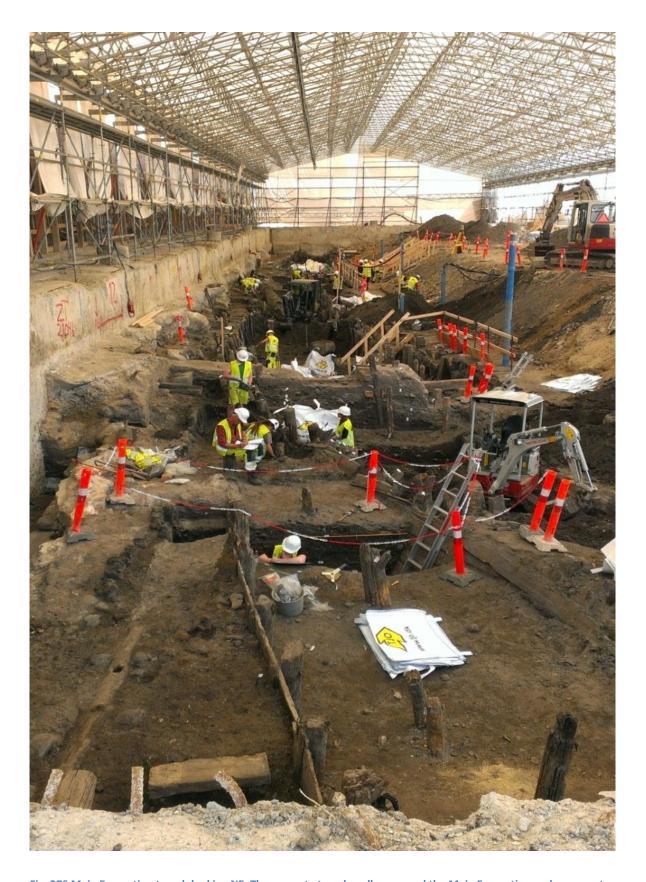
Main Excavation trench looking NE. The concrete trench walls surround the Main Excavation and represent the former location of the Guide Wall trench. The Stairway trench is located behind (unseen) the eastern trench perimetre (at the far end of the photo). Photo: K. K. Tayanin
